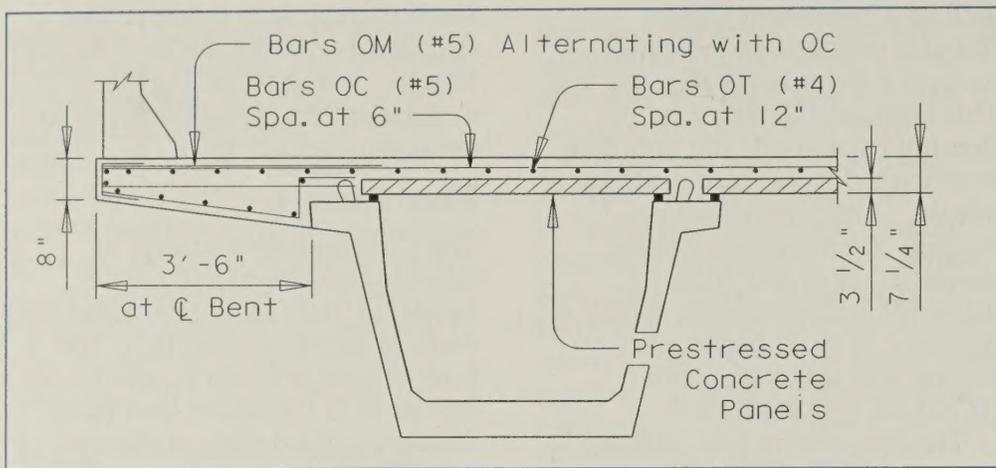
Typical cross section of the southbound Louetta Road structure, showing deck reinforcement.
